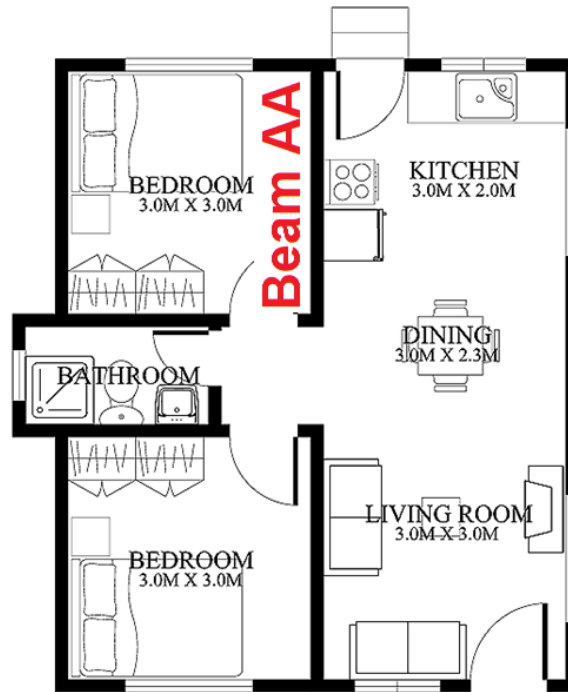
Typical layout plan for a single-storey housing unit in Indonesia
